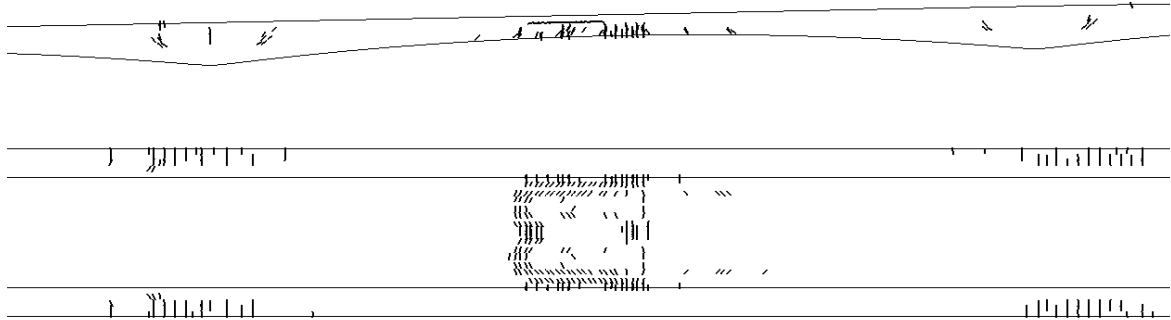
Cracks with crack widths larger than 2 mm at failure: side and bottom views.
